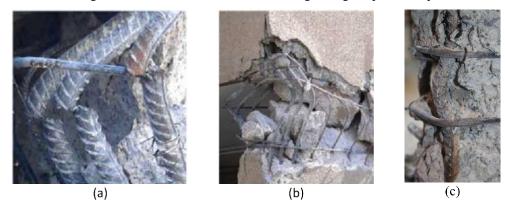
Damage observed in RC walls during the past earthquakes and wall tests (a) Fracture [1], (b) Buckling [1], (c) Buckling [2]
